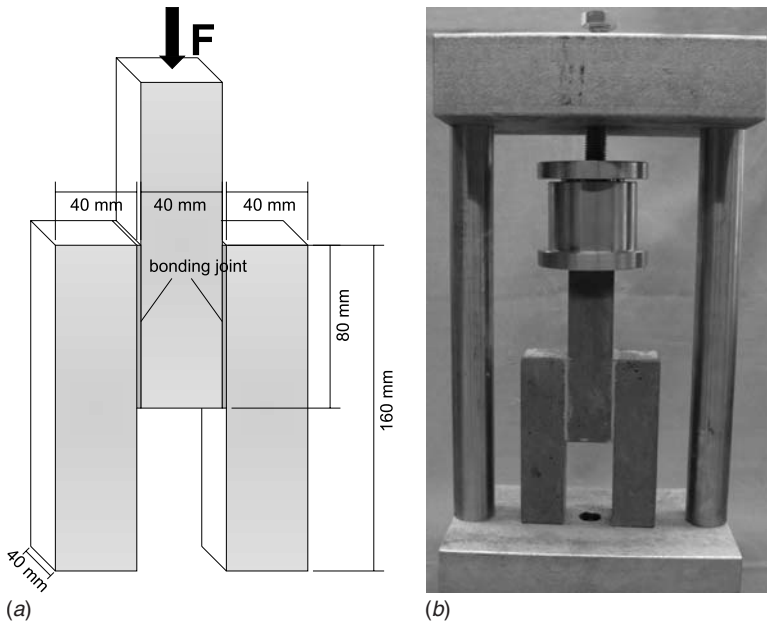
Test specimen type B, dimensions and overlap (a), mounted specimen in frame (b).
